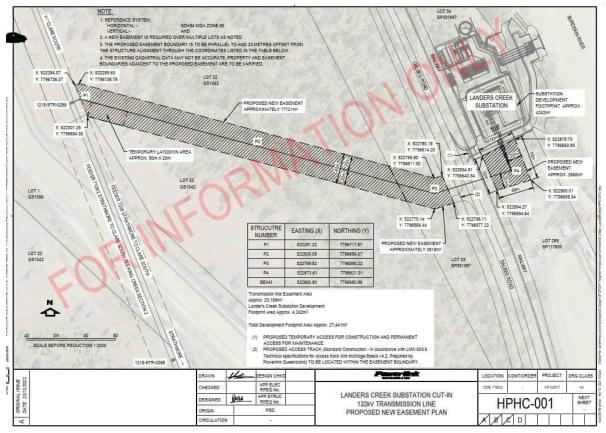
Proposed Alignment of New 132 kV Transmission Line and Substation
